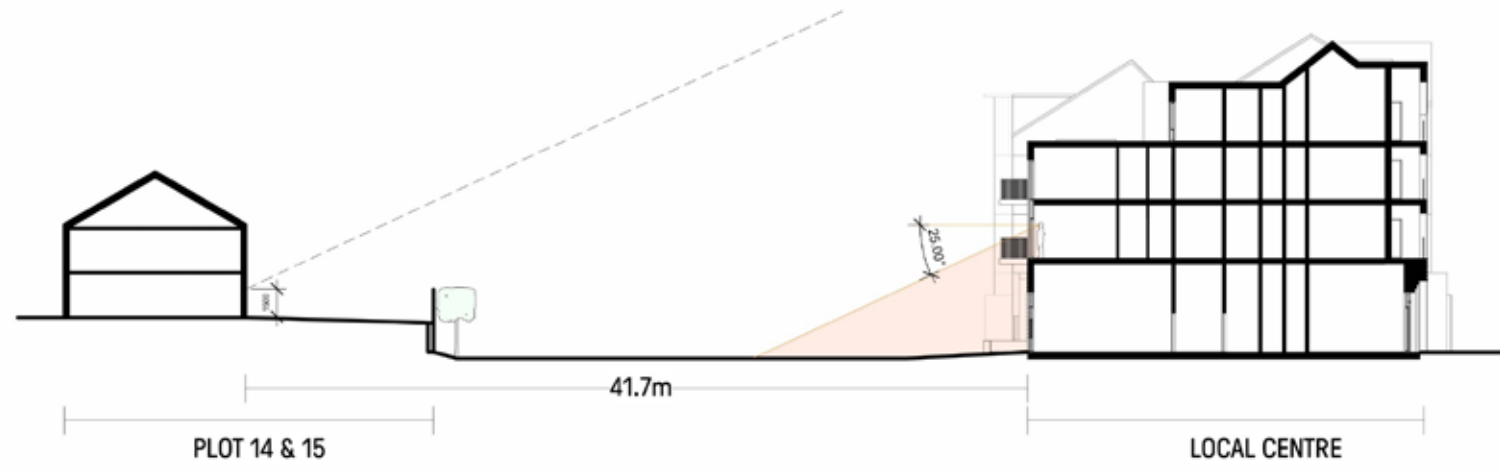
Local Centre & Plot 14 & 15 First Floor Privacy Section prepared for Design Workshop
